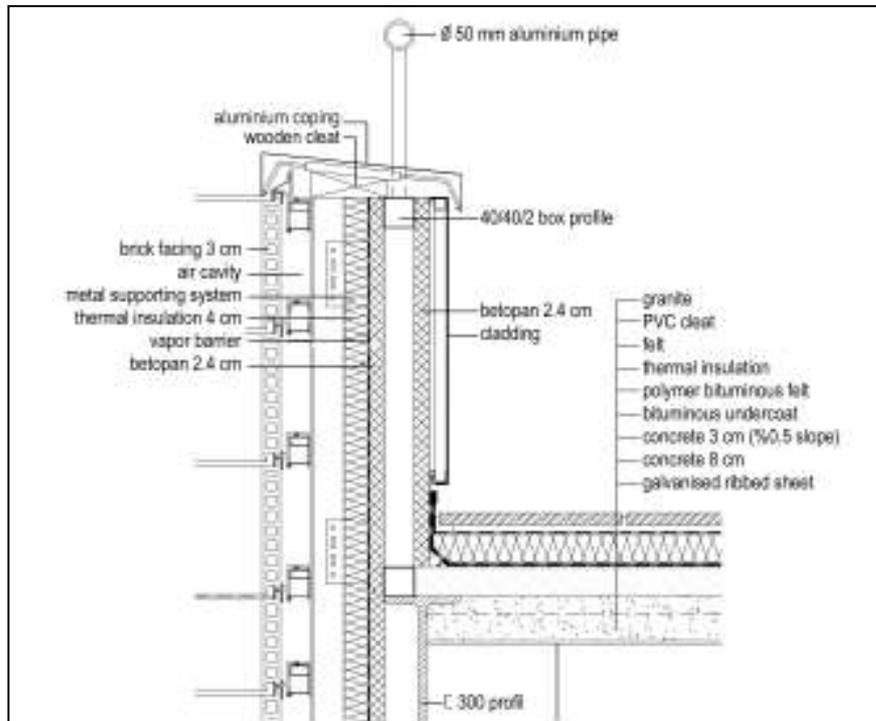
A detail drawing of the terrace-roof and parapet wall
